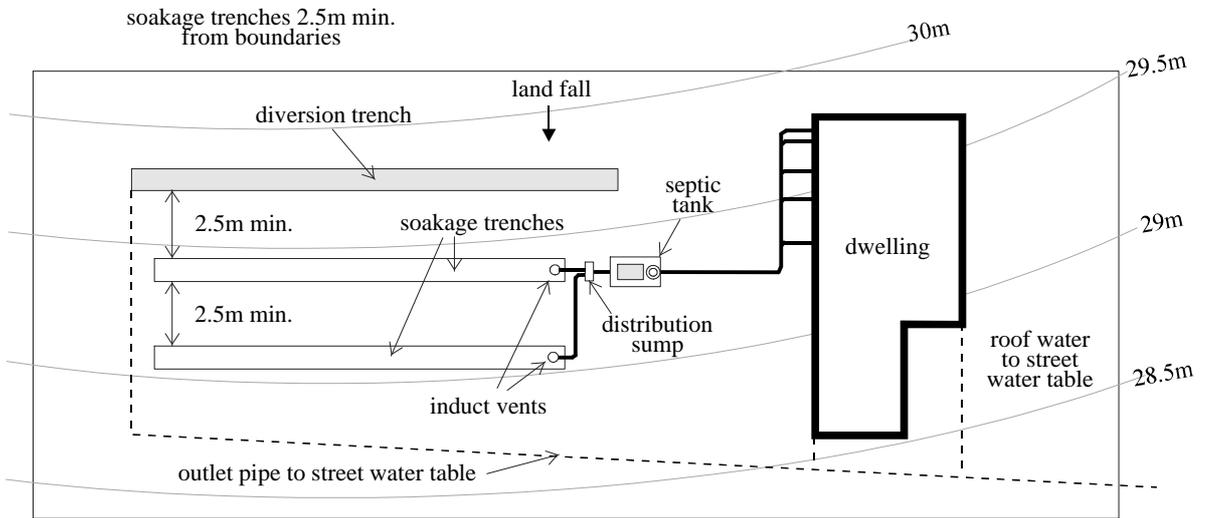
DIVERSION / ROOF WATER DISPOSAL LAYOUT
